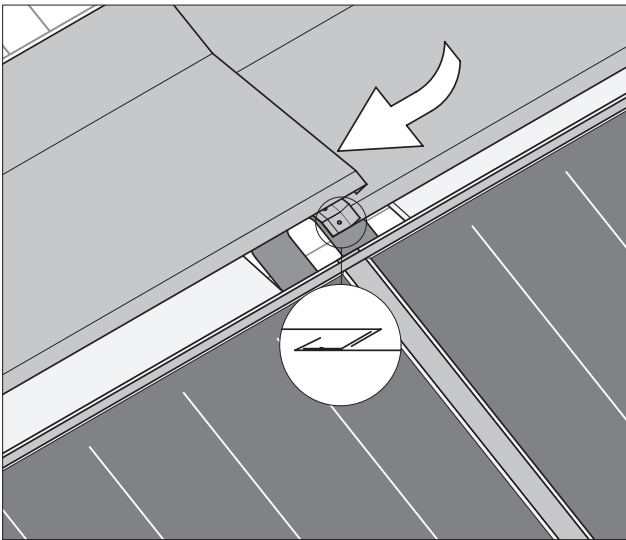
Interlock upper flashing sheets into one another at the crimped edges; use rear ear for fixing sheets against sliding.
